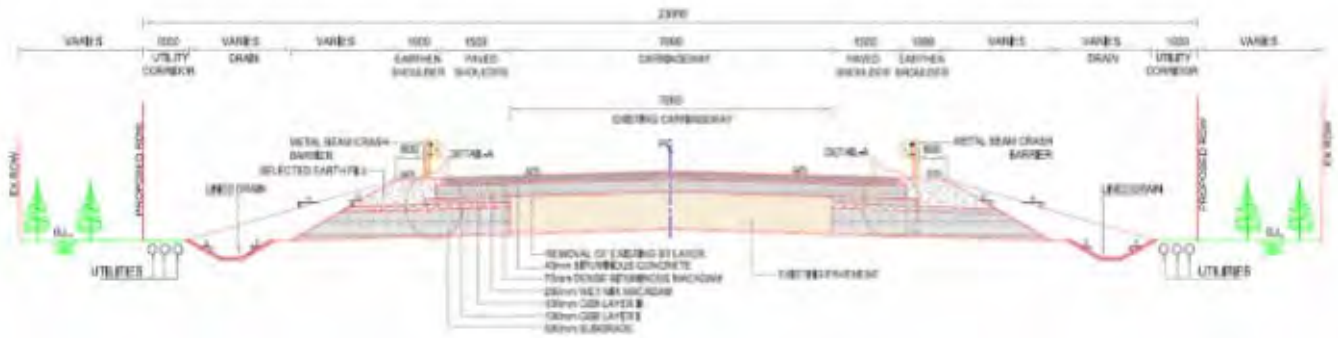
C5 –R-P- Two Lane Carriageway with Paved Shoulder in Rural Area
